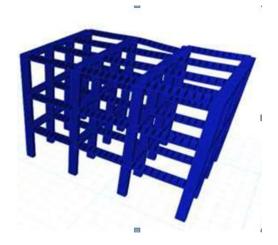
Loading diagram of frame with post tensioned beam strengthened with FRP
